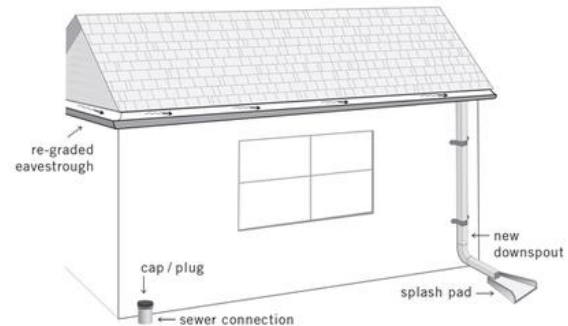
The components of a downspout assembly, Disconnect from sewer and used in vegetation
